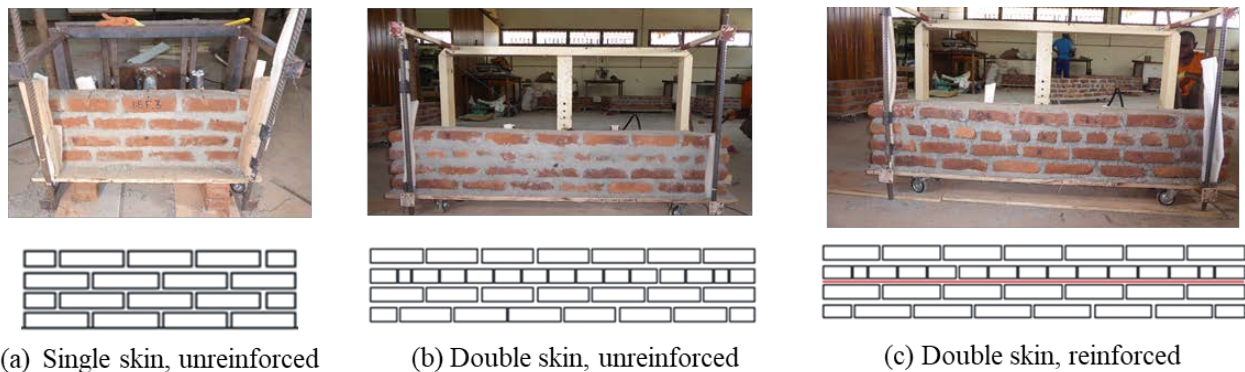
Types of panels and reinforcement tested out-of-plane/perpendicular.
